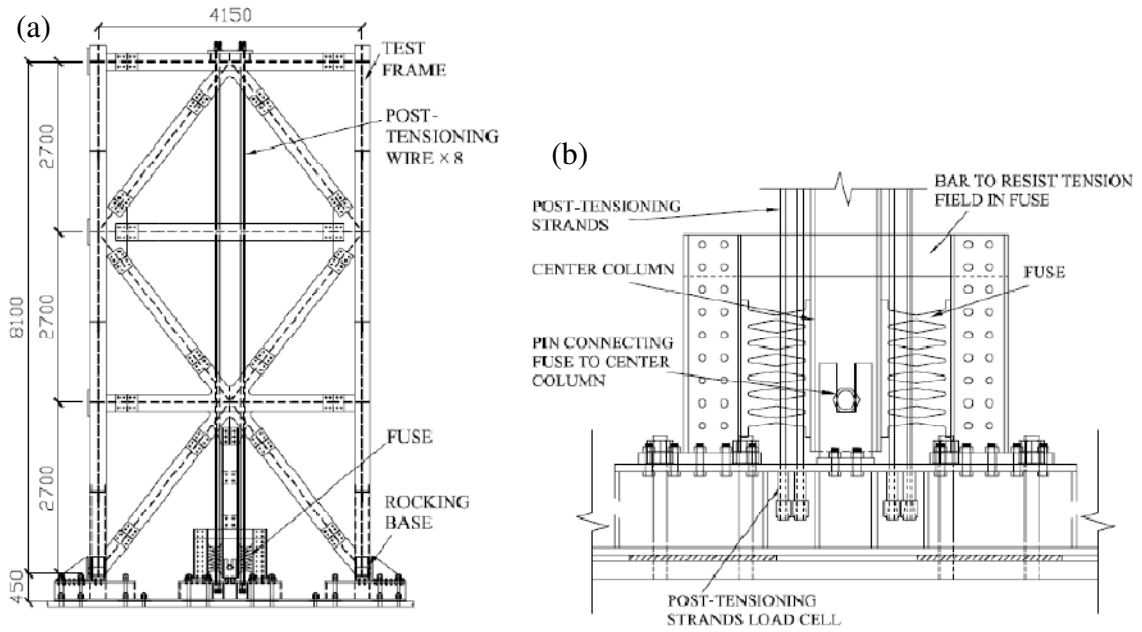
Drawings of controlled rocking frame used for shake-table testing: (a) overall view; (b) detail at fuse (Ma et al. 2010)
